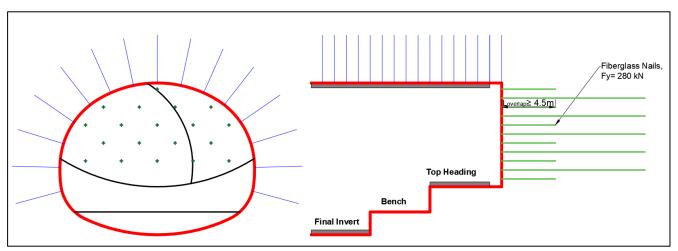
Proposed tunnel face stability reinforcement by fiberglass nails.
